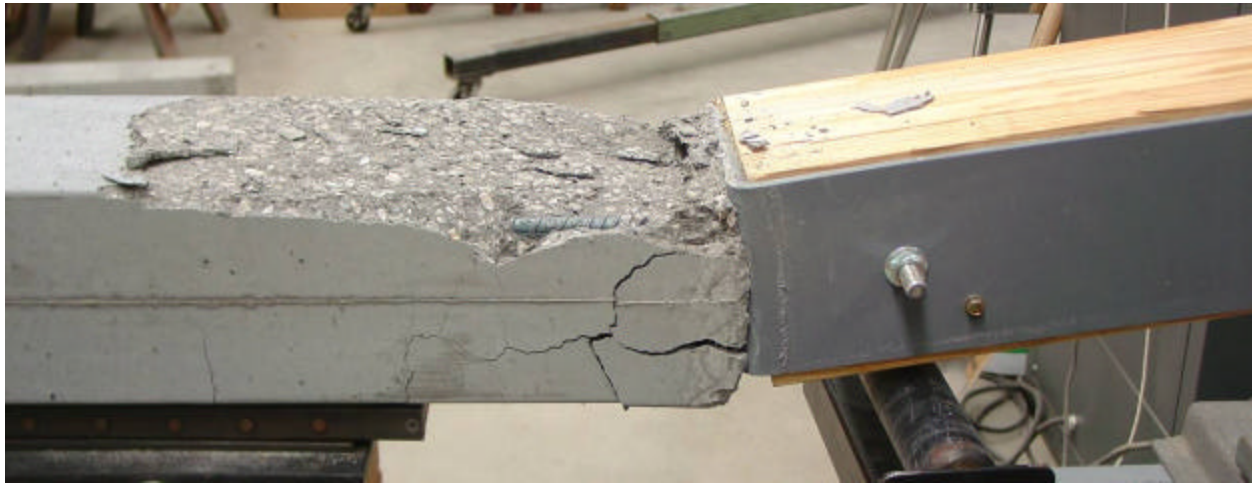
Typical bending failure mode for concrete-to-steel bracket connection.
